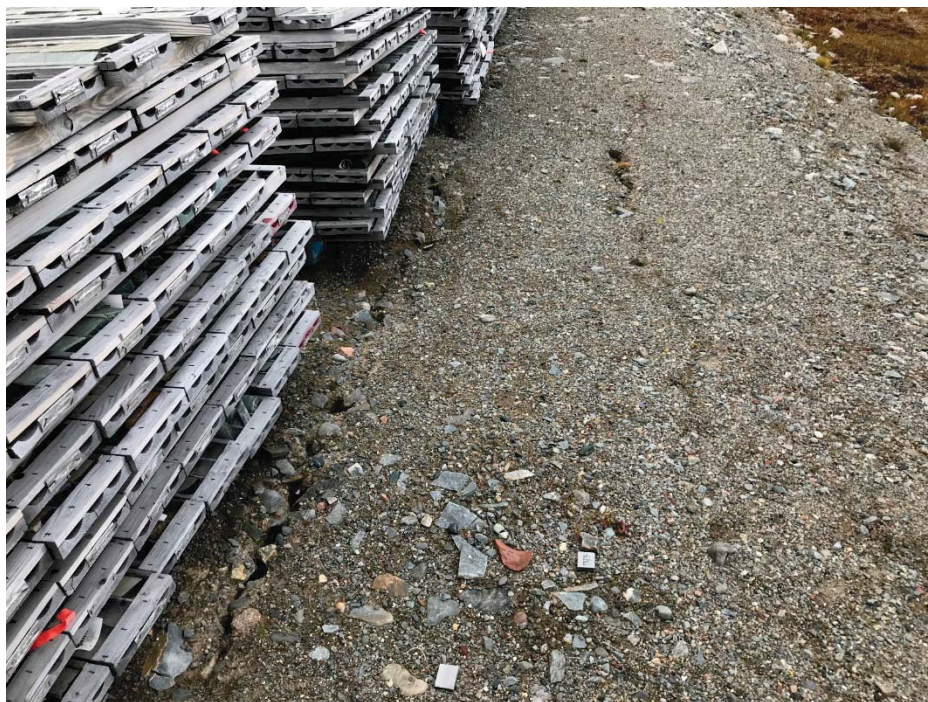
Exploration Camp Landfarm, East Slope and Crest, Looking Southeast (10 September 2018)
